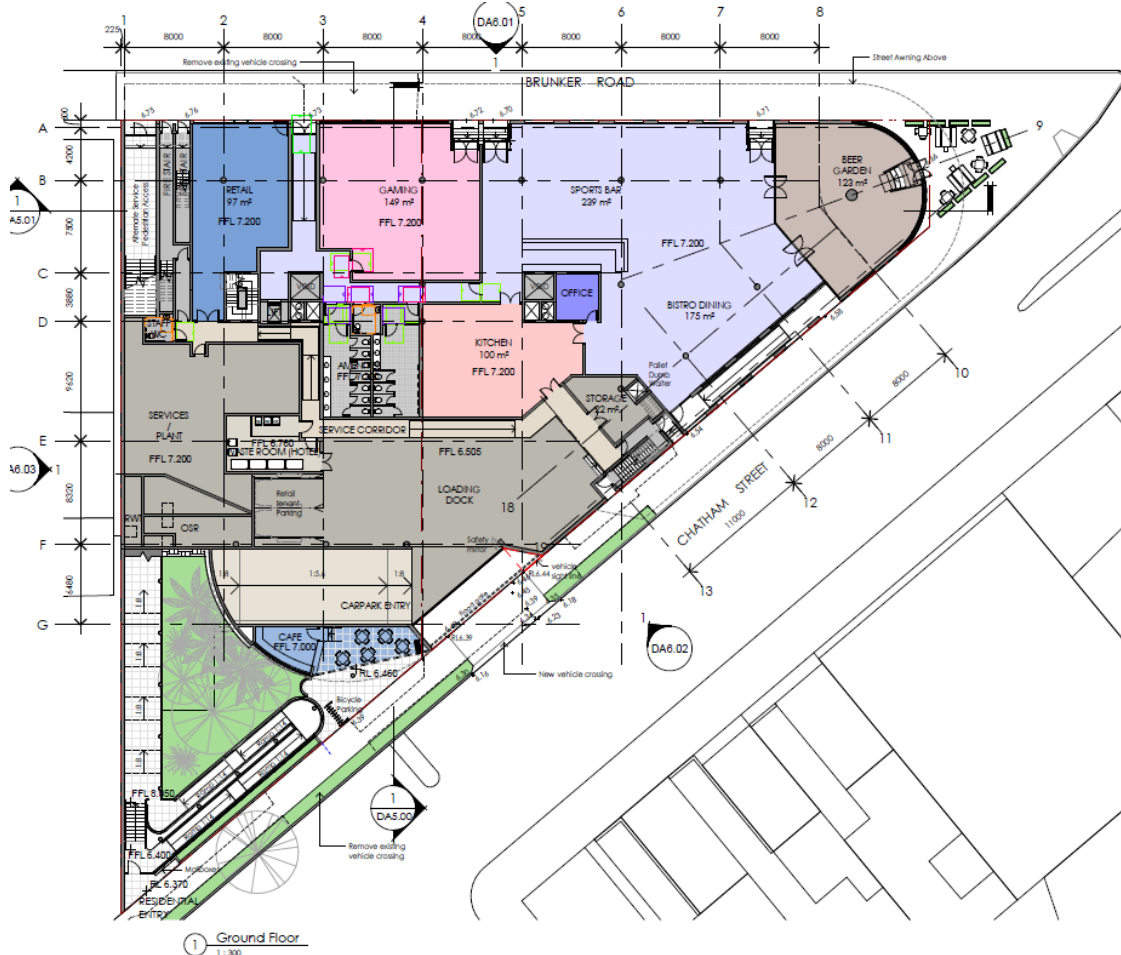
Street activation and amenity (Source: JSA Studio Architects)
